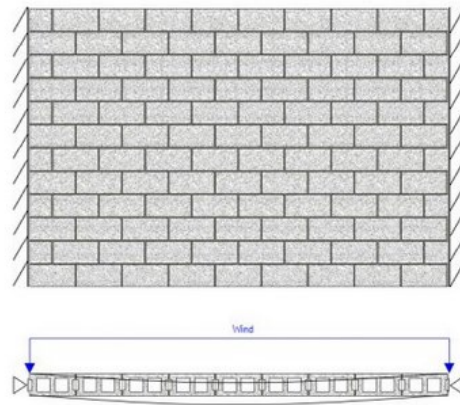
Horizontal Bending (Canada Masonry Design Center, 2017)
